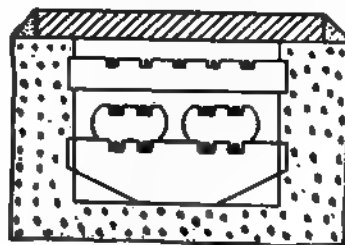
Section of culvert with unstrained strip showing insulators.
